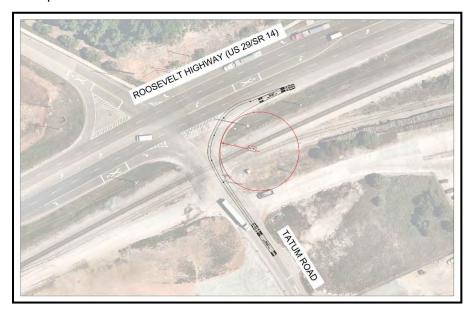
Roosevelt Highway (US 29/SR 14) at Tatum Road/Wilkerson Mill Road – Northbound Right (Exiting Truck)
